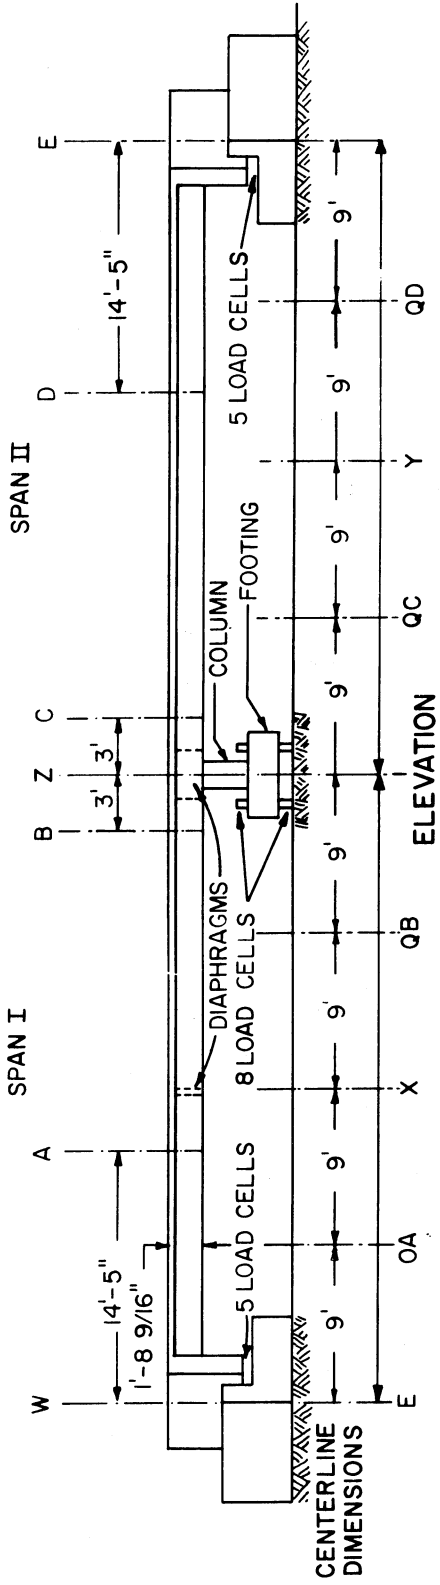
FINAL LOAD TEST ON CURVED BOX GIRDER BRIDGE MODEL
